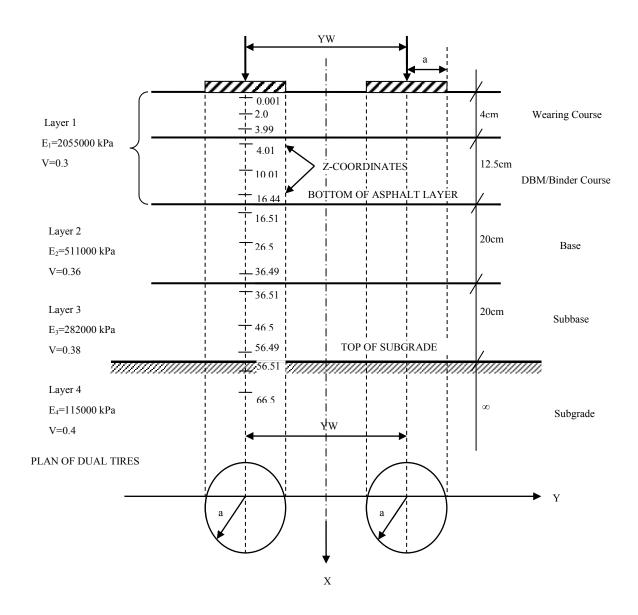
Structural Presentation of Pavement for Analysis for Dry Sub-Humid Zone
